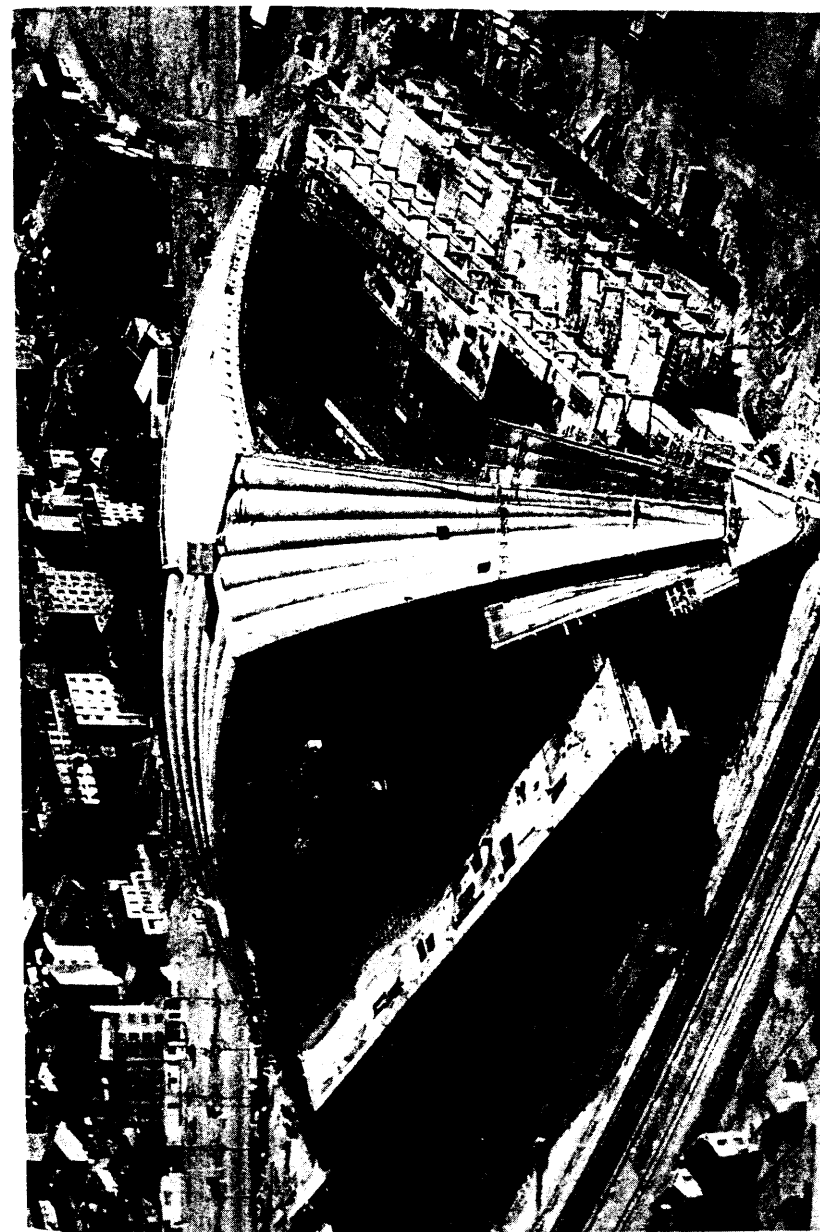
THE FIRST CONSTRUCTION SECTION OF THE ROOF WAS COMPLETED IN MARCH 1958.
